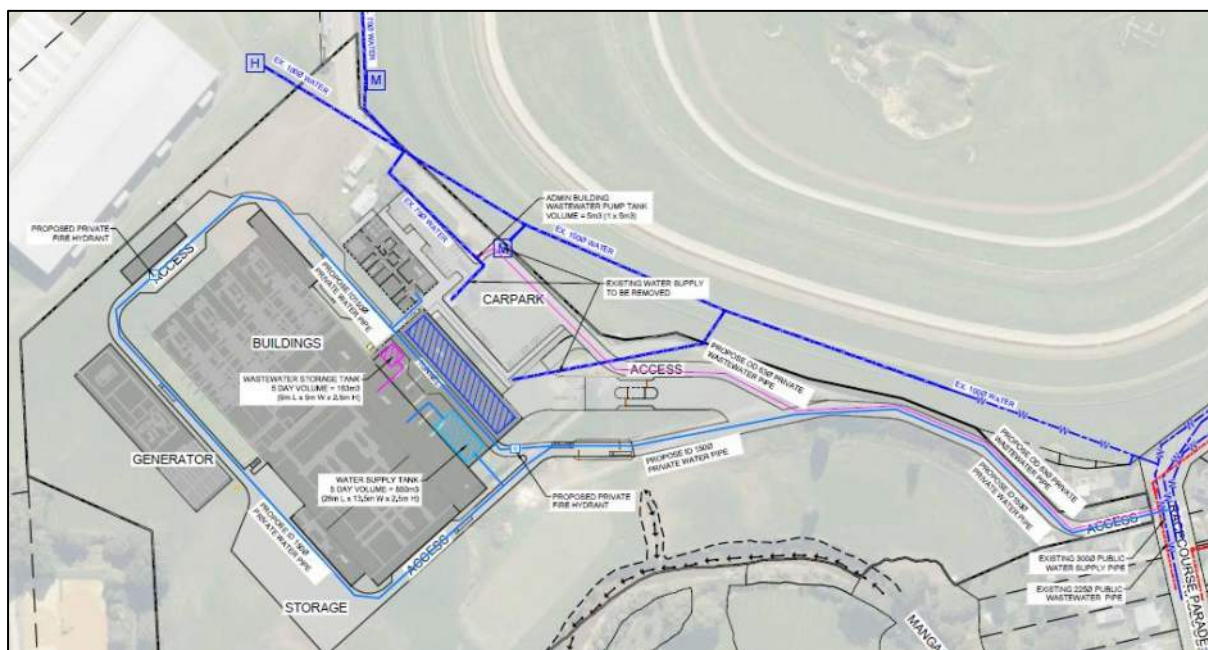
Proposed Domestic Wastewater & Water Supply layout
